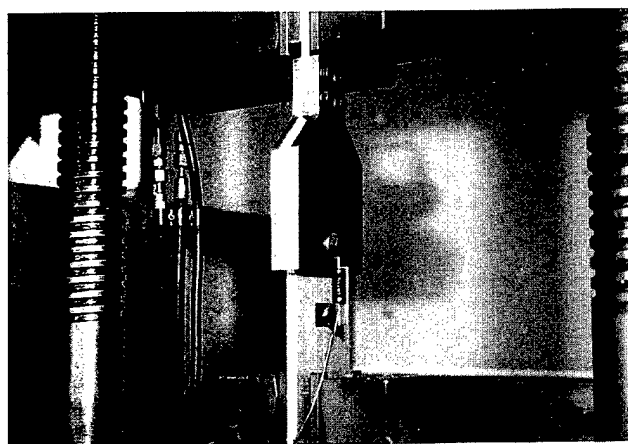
Single-bolt tension joint ready for test in the Amsler Universal Testing Machine.
